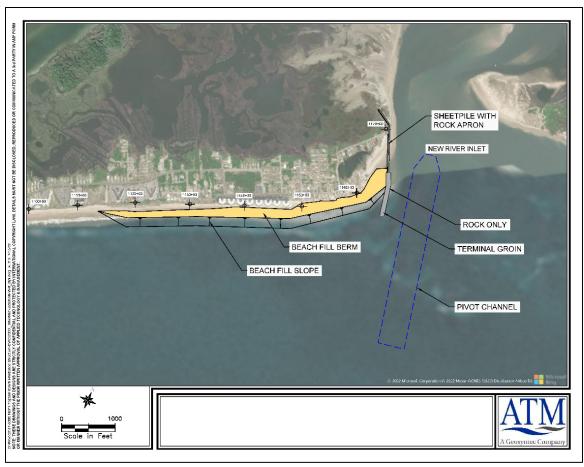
Alternative 5 (Town's Preferred Alternative) Beach Fill, Terminal Groin, and Pivot Channel Layout
